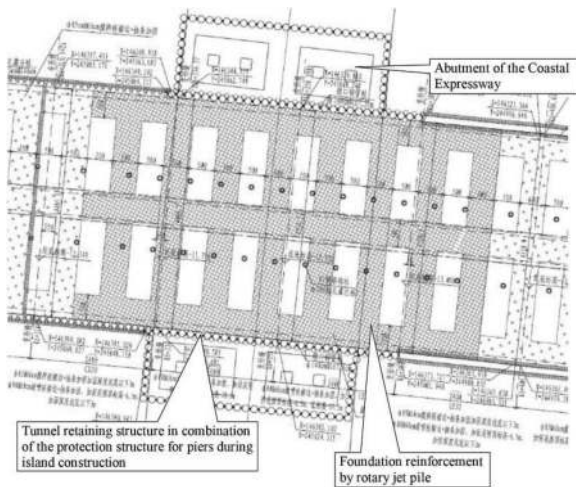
Layout of excavation reinforcement at the location of tunnel passing through Coastal Expressway.
